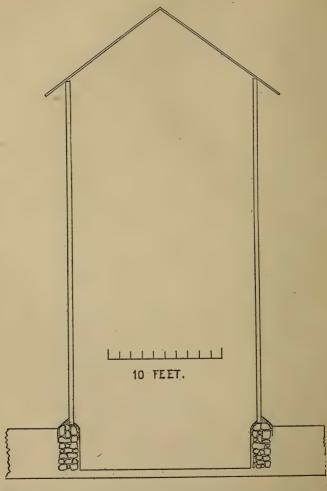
Showing method of placing all-wood silos on stone foundations, with pit dug out to increase depth.
